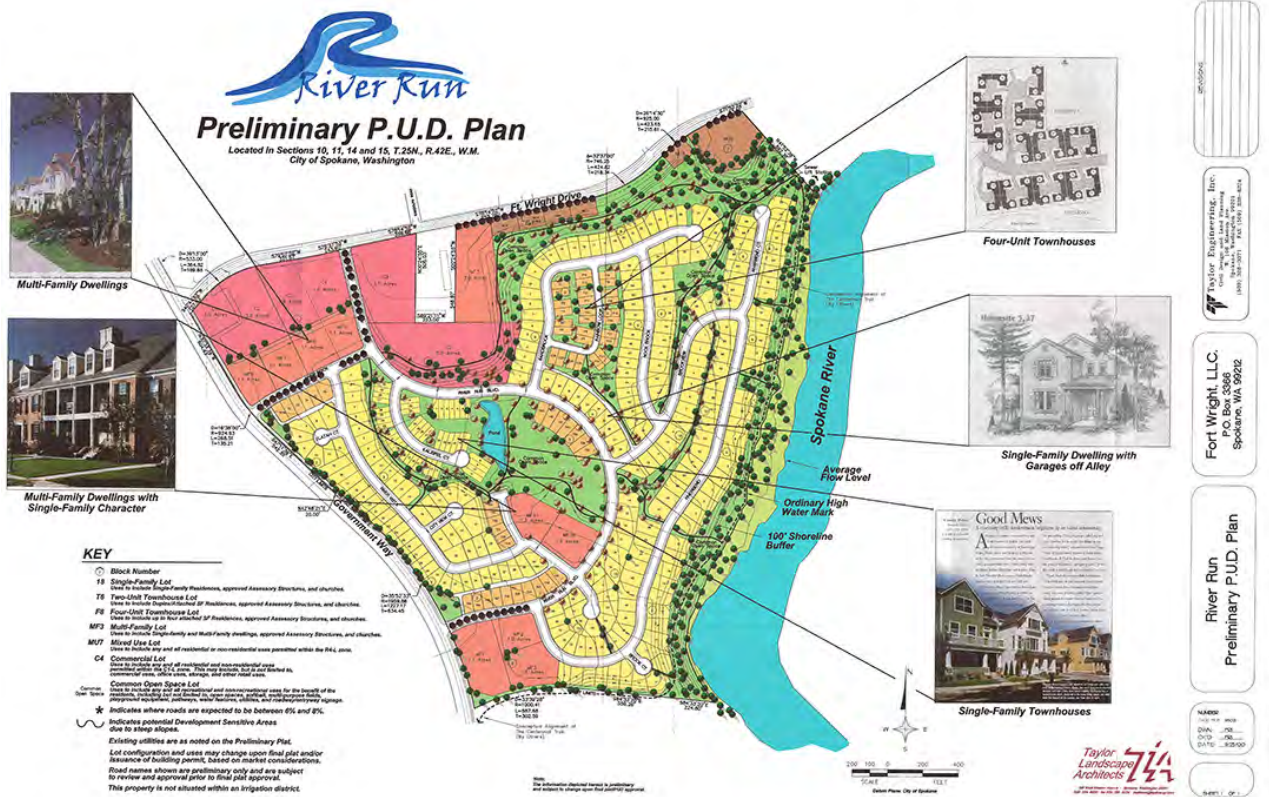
Initial plans for the River Run PUD featured a wide range of housing types as well as retail and mixed-use buildings. Though the build-out differs in some ways, developers hope to provide retail near Randolph Road, as well as townhomes along FGW where indicated in this 2000 plan. (Image: City of Spokane)
